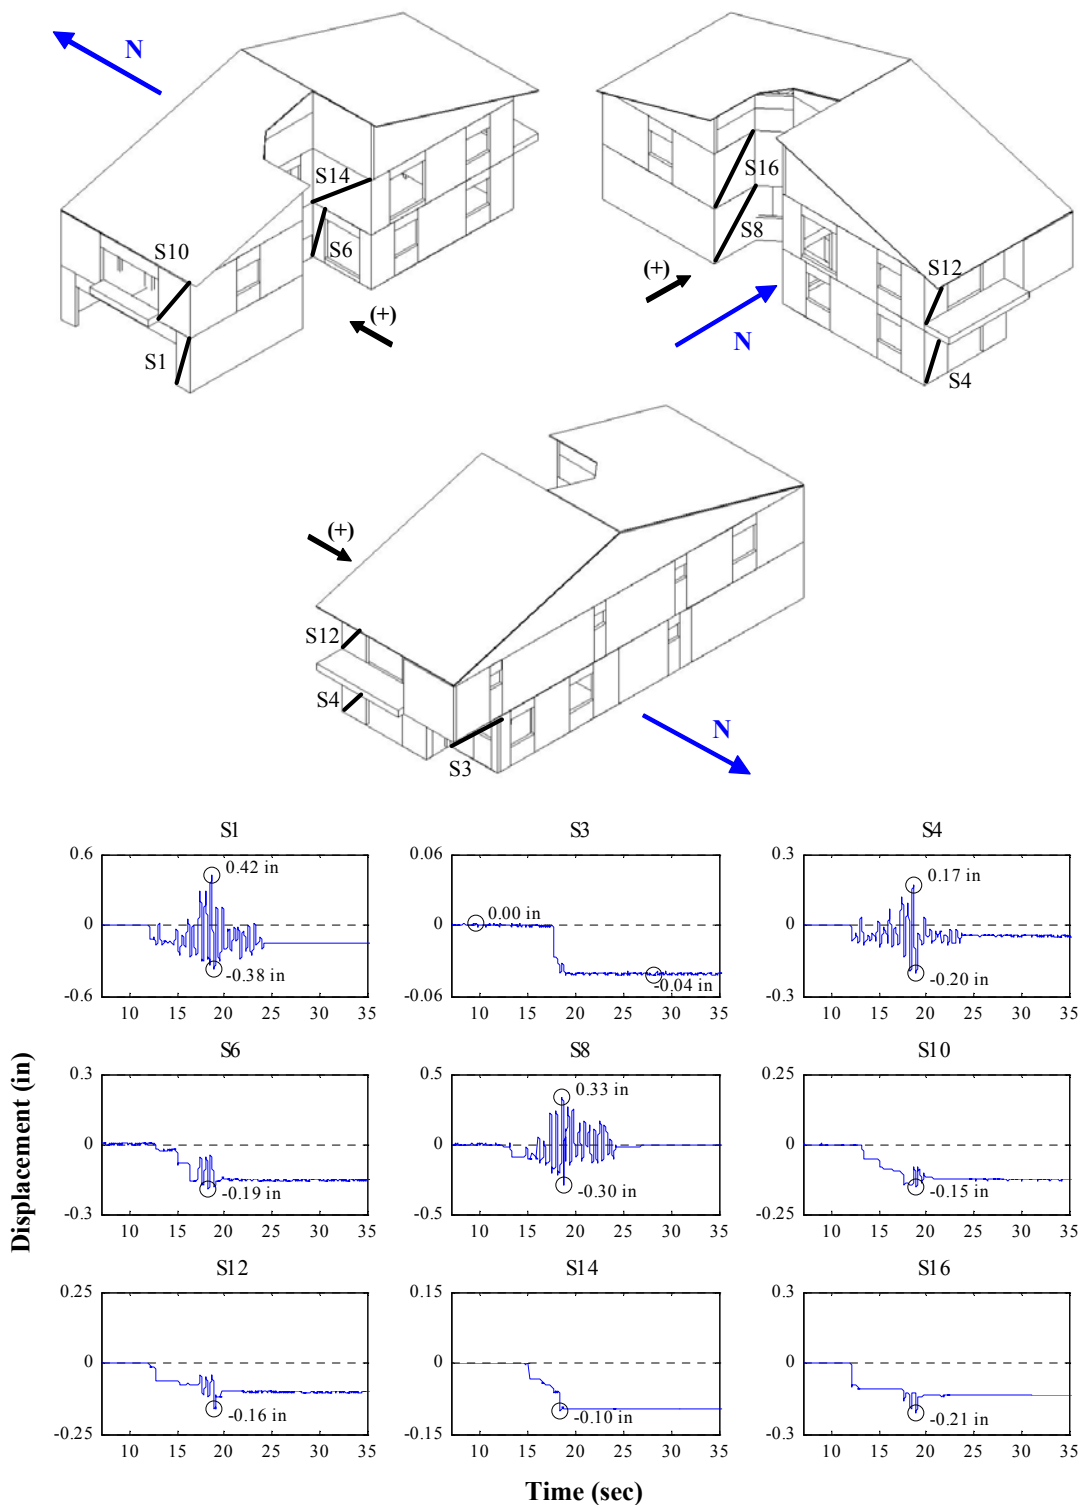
Wall deformations of north-south external walls for Test NWP3S03
